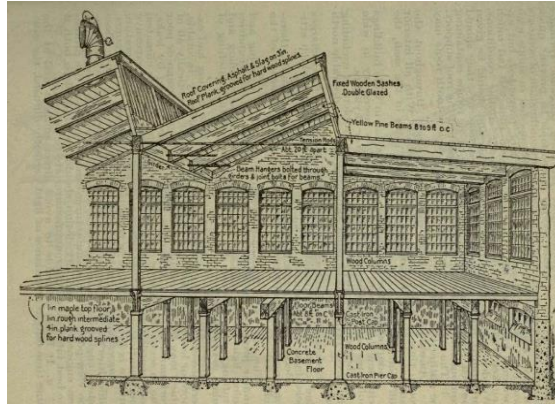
A building of a similar layout to the industrial mill building from where the column was sourced [5]
